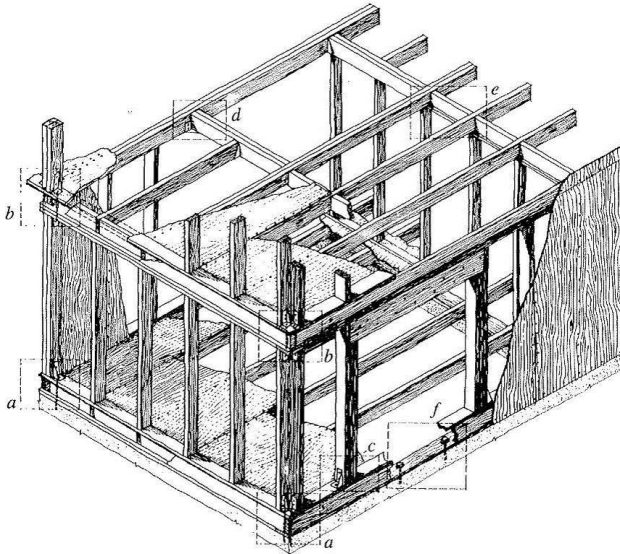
Detailing examples for a timber frame building. *a* prevention of uplift, *b* tensile joint in vertical members, *c* reinforcement of wall opening by adding studs and lintels, *d* reinforcement of diaphragm openings by adding girders and trimmer joists, *e* stiffening of floor beams by adding blocks, *f* prevention of sliding. (STEP 1995 Article D10)
